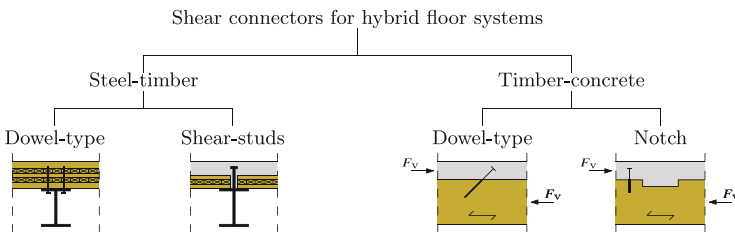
Schematic illustrations of common shear connectors used in hybrid floor systems, including steel-timber and timber-concrete configurations.
